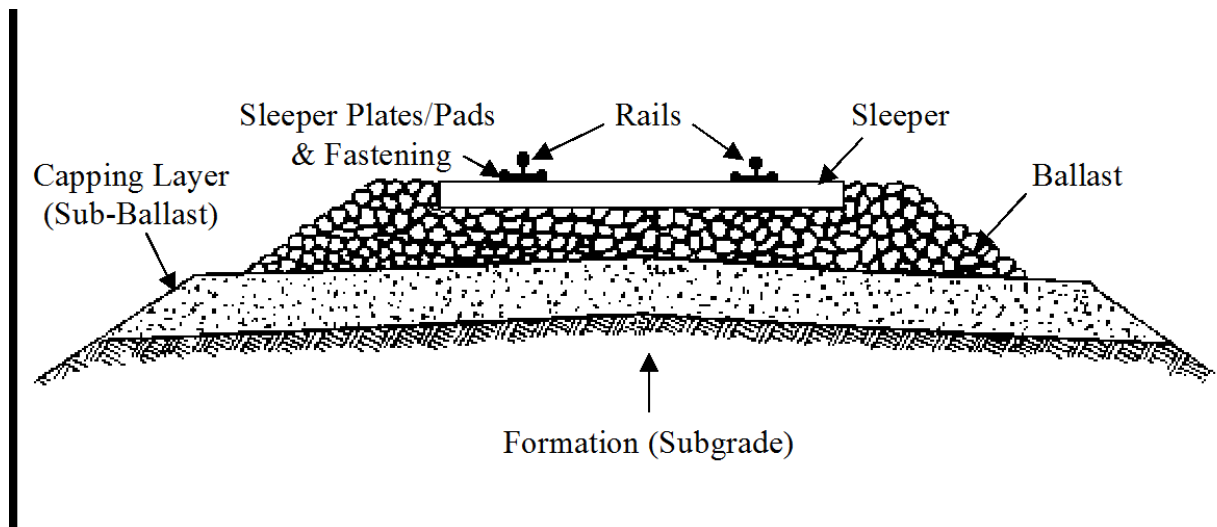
Cross-section of typical railway track.(Hawari, 2007)
